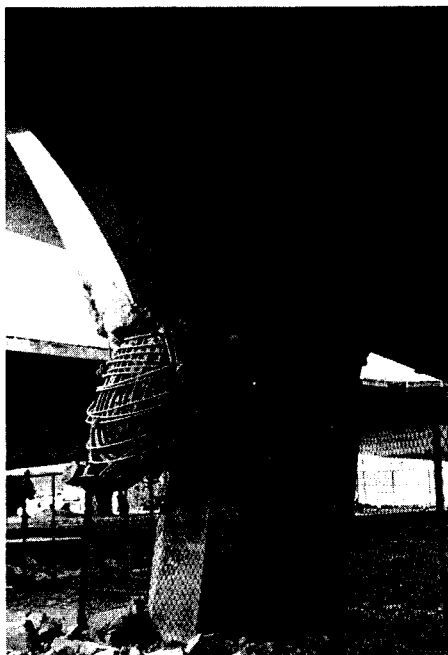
Shear failure of column of 118/Mission-Gothic undercrossing.
